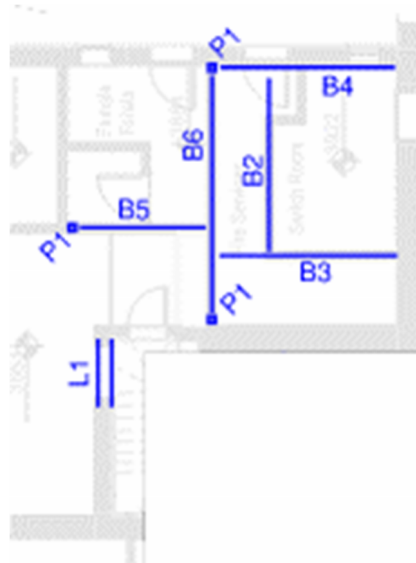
Part plan of beams supporting roof structural to facilitate wall removal.
